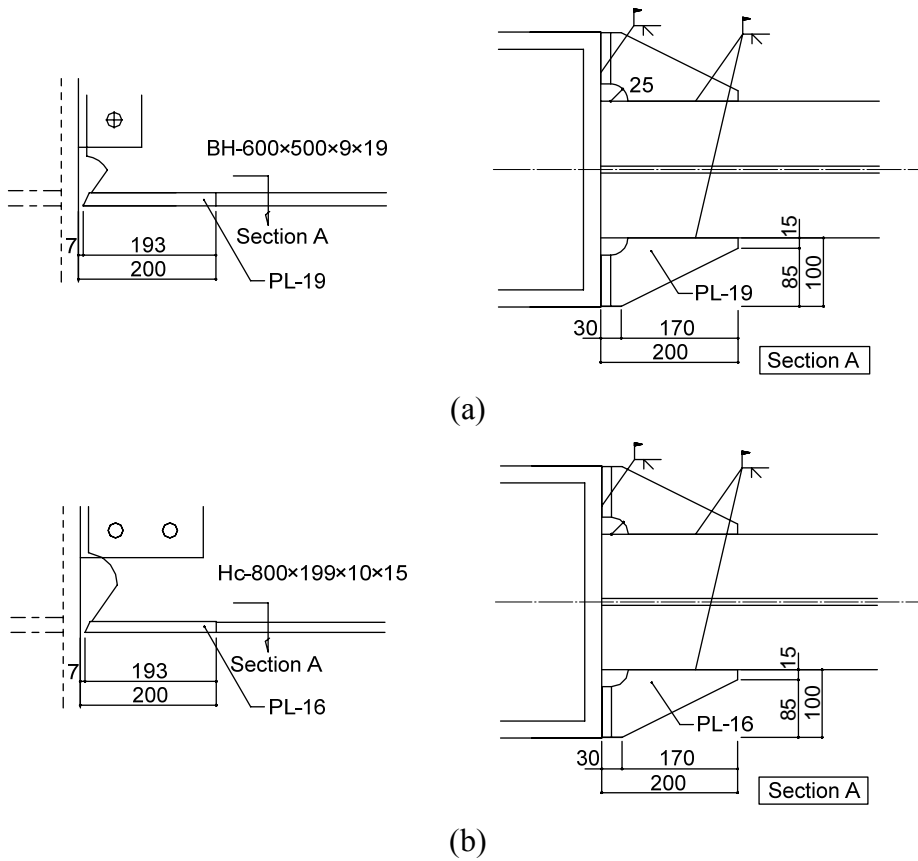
Details of the wing plate connection: (a) 600 mm depth beam; (b) 800 mm depth beam
